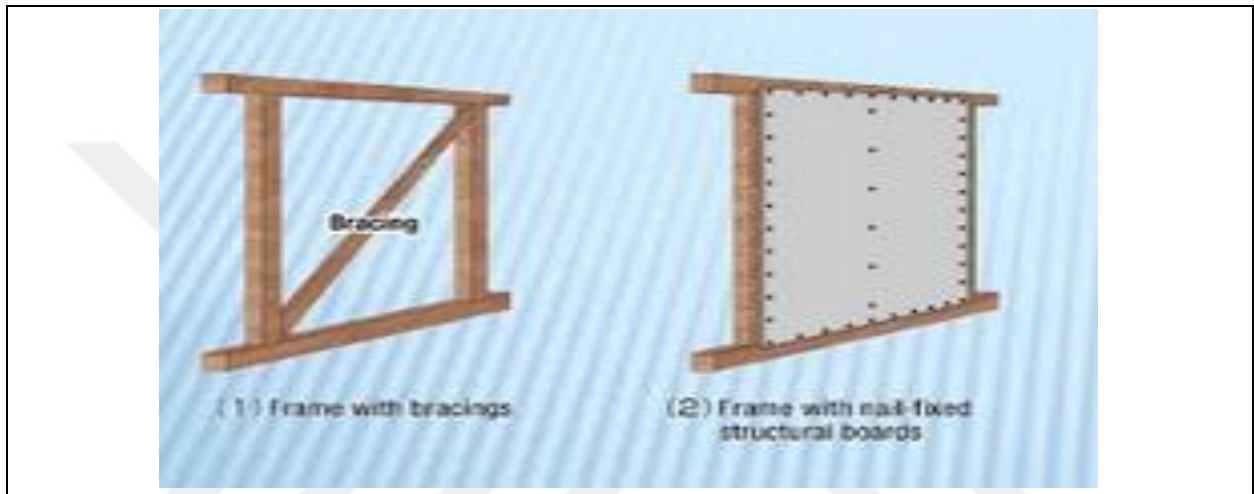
Columns Supported Shear Walls (<https://www.slideshare.net/rajatrmr/shear-walls-87240979>)
